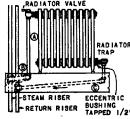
C. Connections where runouts are between floor and ceiling. Similar connections are used if runouts are below the ceiling.
